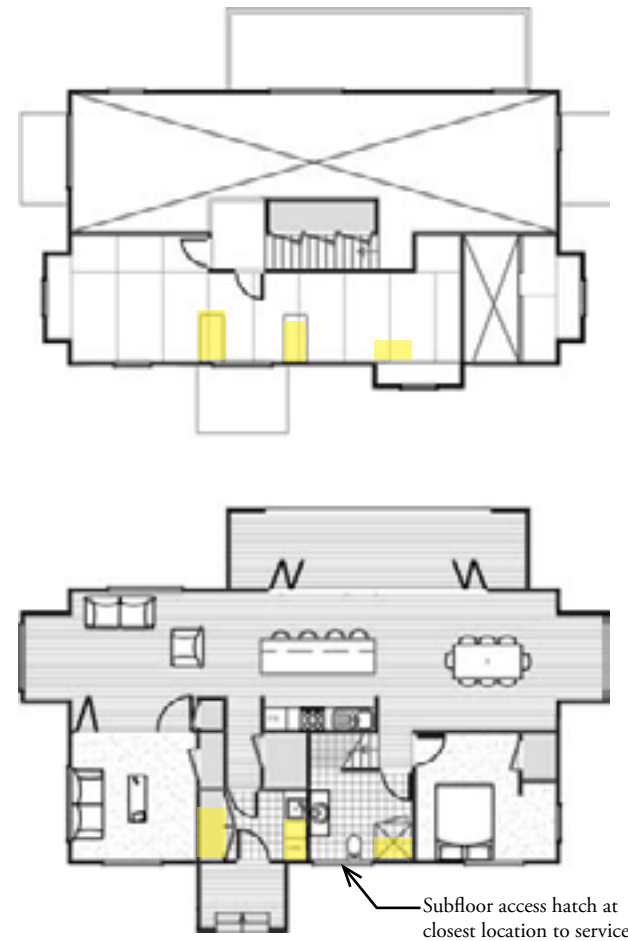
Large Version Ground Floor Plan. Possible locations to bring services down from first to ground floor are shown in yellow.
